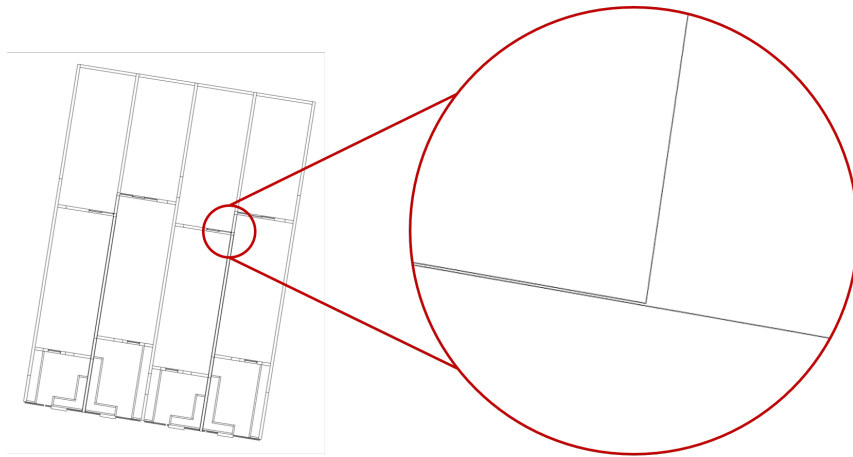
Small Gaps within the floor plan that is scattered throughout the model
